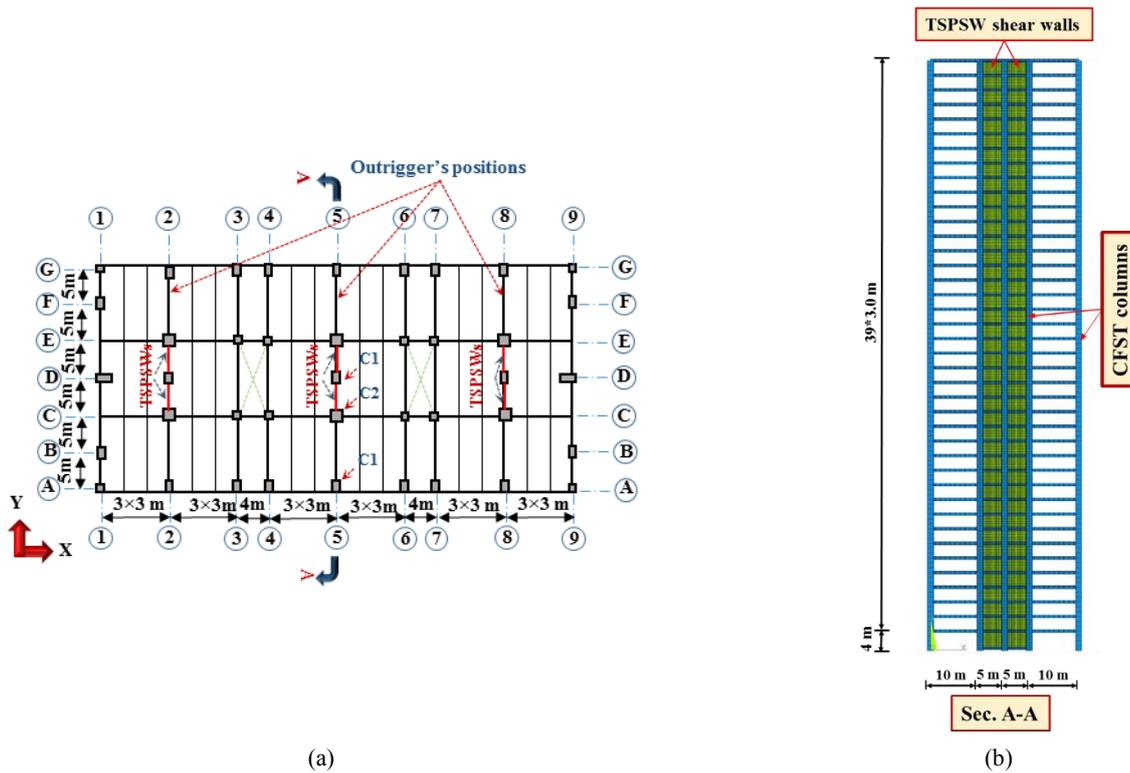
Geometric details of the buildings: (a) plan and; (b) elevation at section A-A
